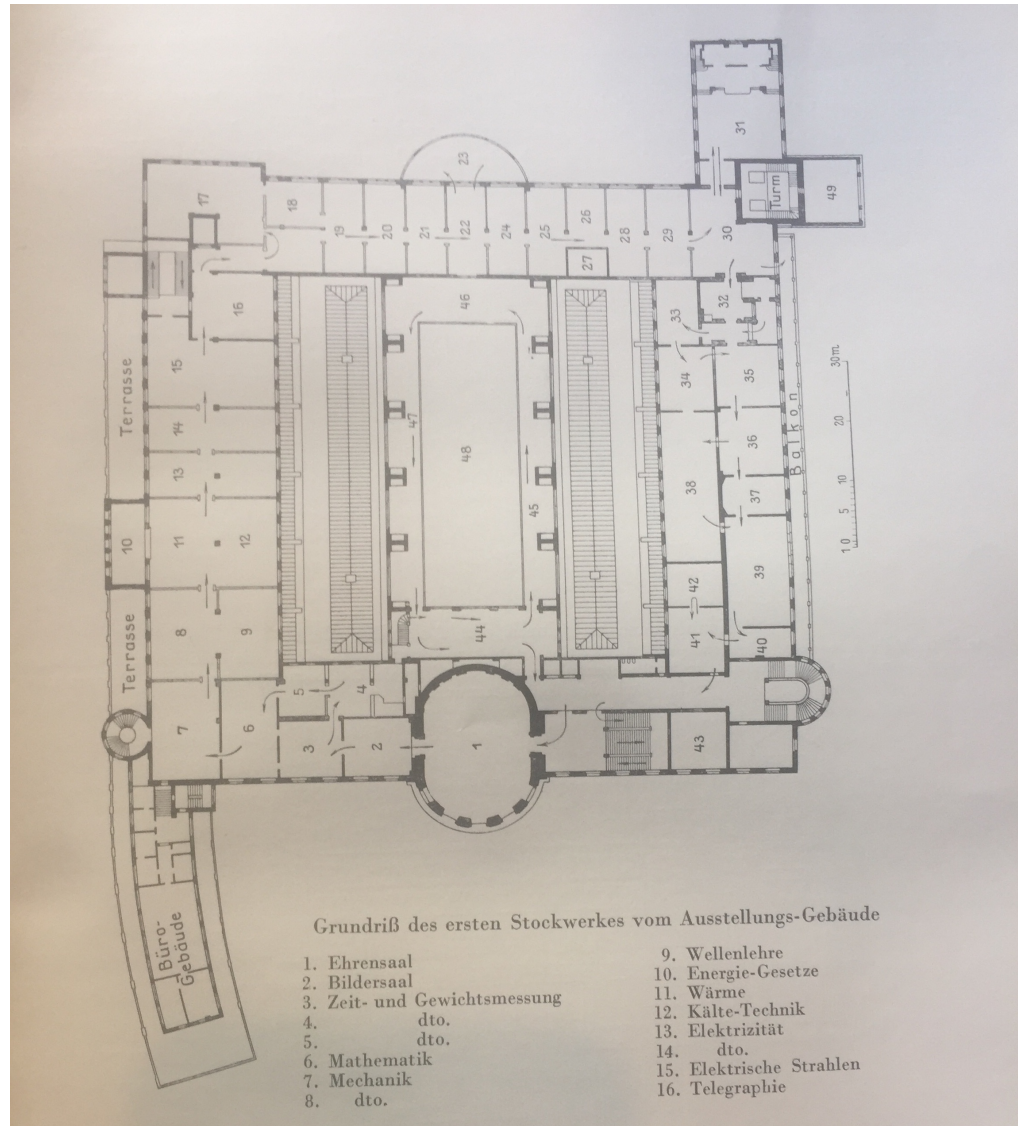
Proposed second floor floorplan. Note the arrows indicating movement. Courtesy Deutsches Museum Archives.
